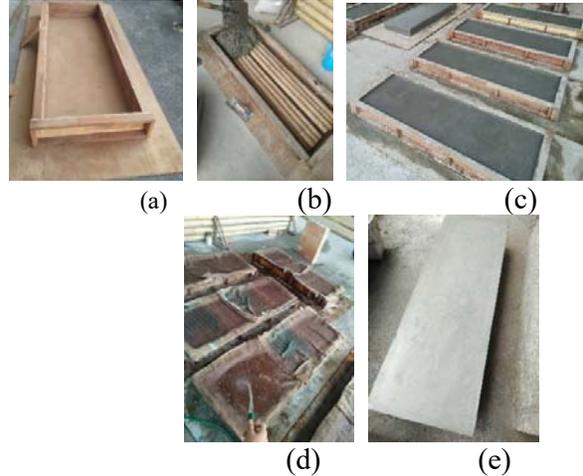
Bamboocrete Multi-purpose Panel Casting. (a) Wooden formwork (b) Pieces of wrapped bamboo placed in formwork (c) Bamboo casted in lightweight concrete (d) Curing for 28 days (e) Sample Panel
